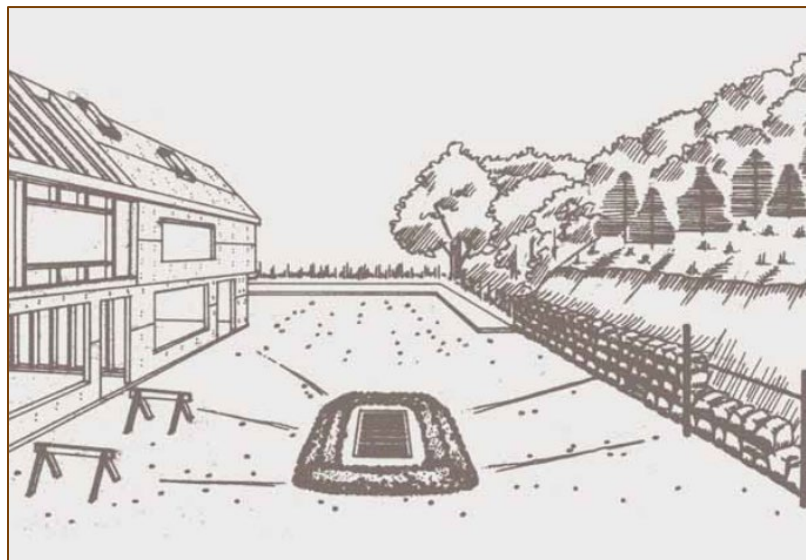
68 Check Dam at Culvert Inlet on Slope
